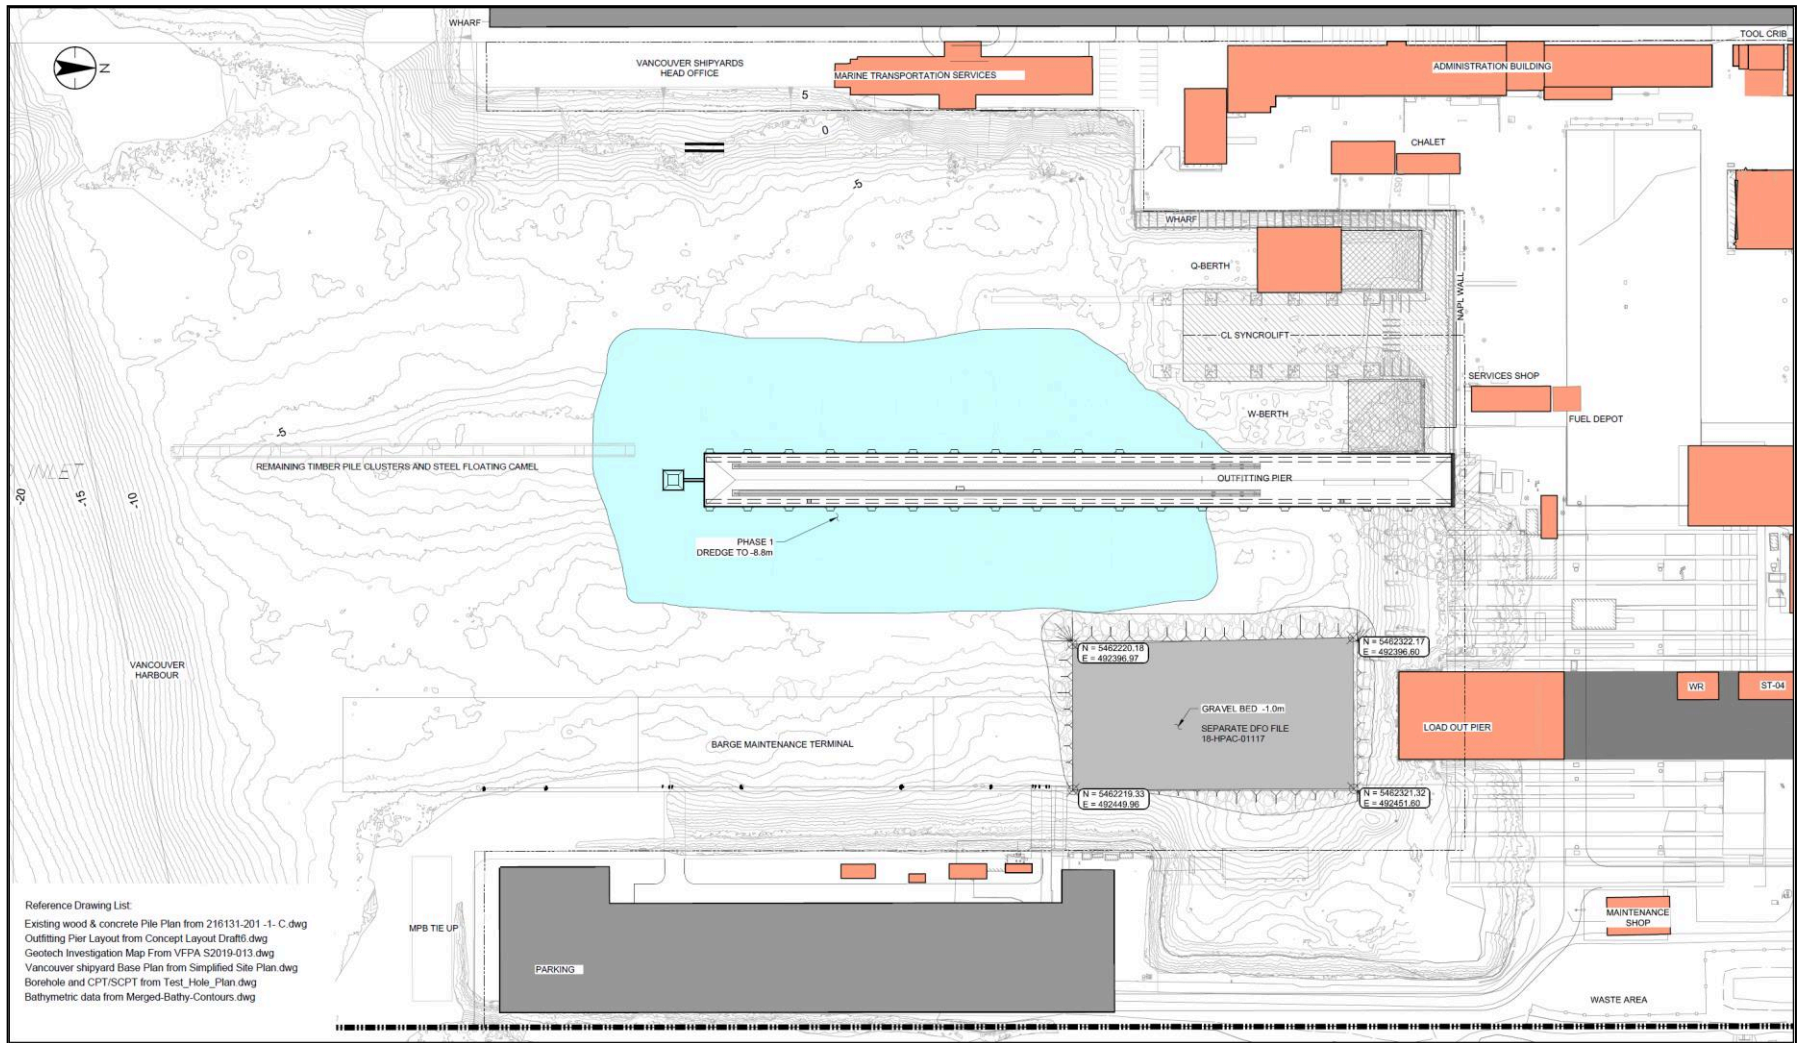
Seaspan Vancouver Shipyard Outfitting Pier Extension Dredge
